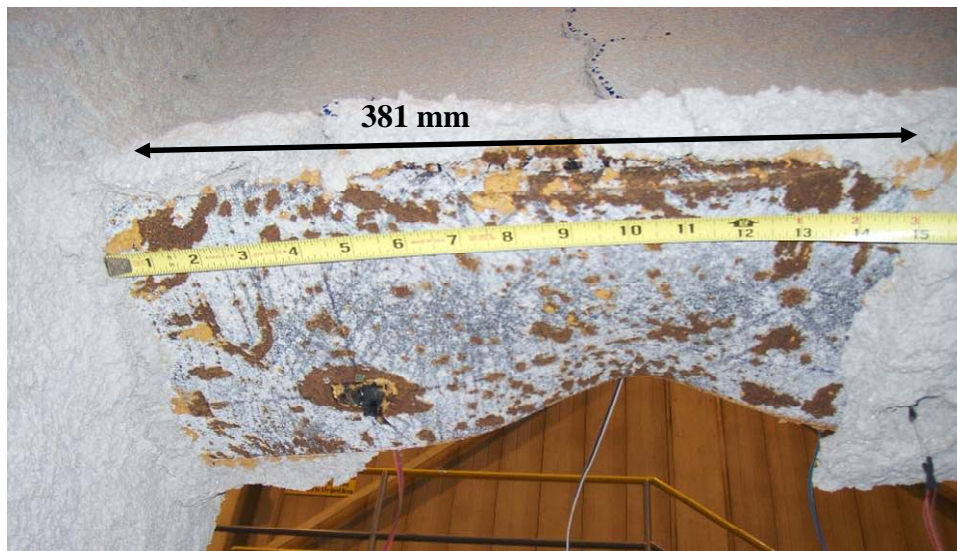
Damage to SFRM on bottom flange of WM assemblage test during step 11
